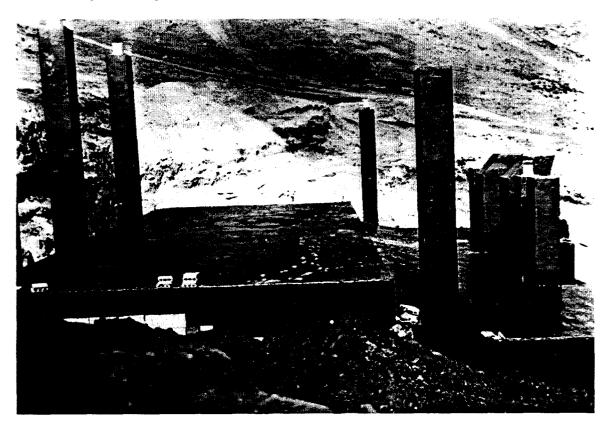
Battery Townsley, Fort Cronkhite, 1938-1940. Under construction, showing damp-proof membrane. Courtesy of the Park Archives of the Golden Gate National Recreation Area.
